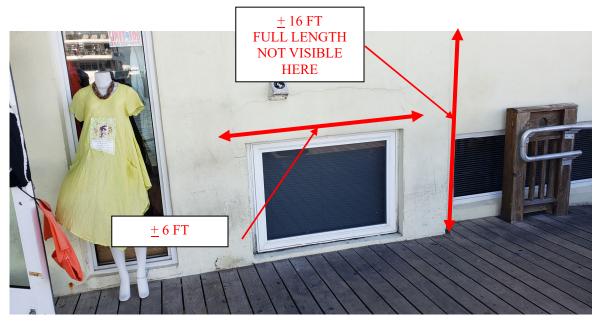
Location 32: Approximately 16 ft long new 16x12 concrete column. See detail 6/S104. Approximately 6 ft long new 12x16 horizontal tie-beam/header. See detail 8/S105 - tie-beam /header replacement detail.
